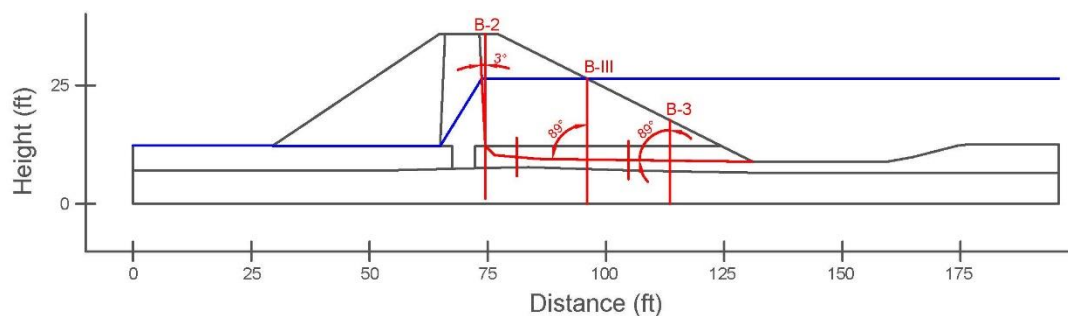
Sub-sectioning of the cross-section and failure plane for La Marquesa Dam – U/S Slope
